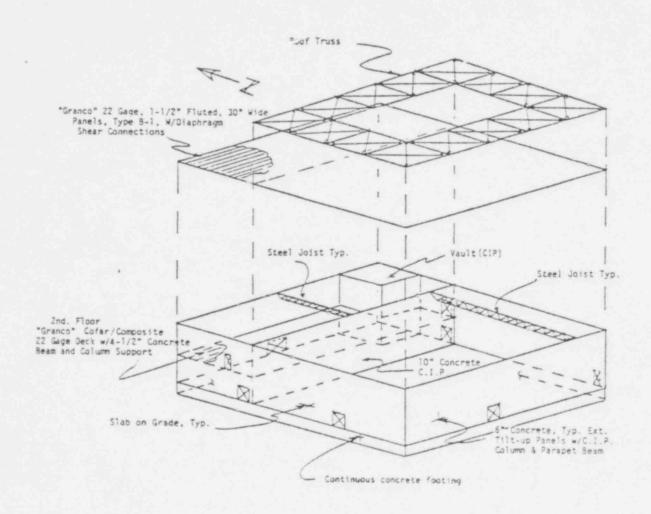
MOFP MAJOR STRUCTURAL ELEMENTS
